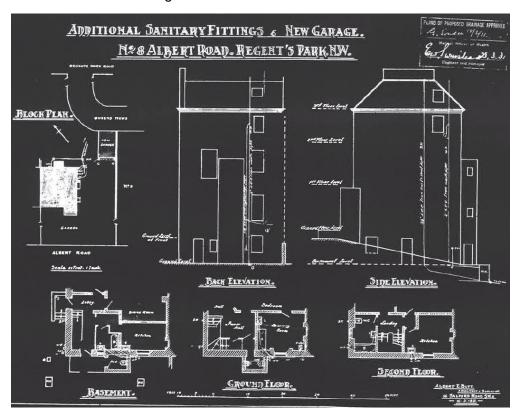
(above): Approved 1903 drainage plans of then No. 8 Albert Road (Source: Camden Archives).
